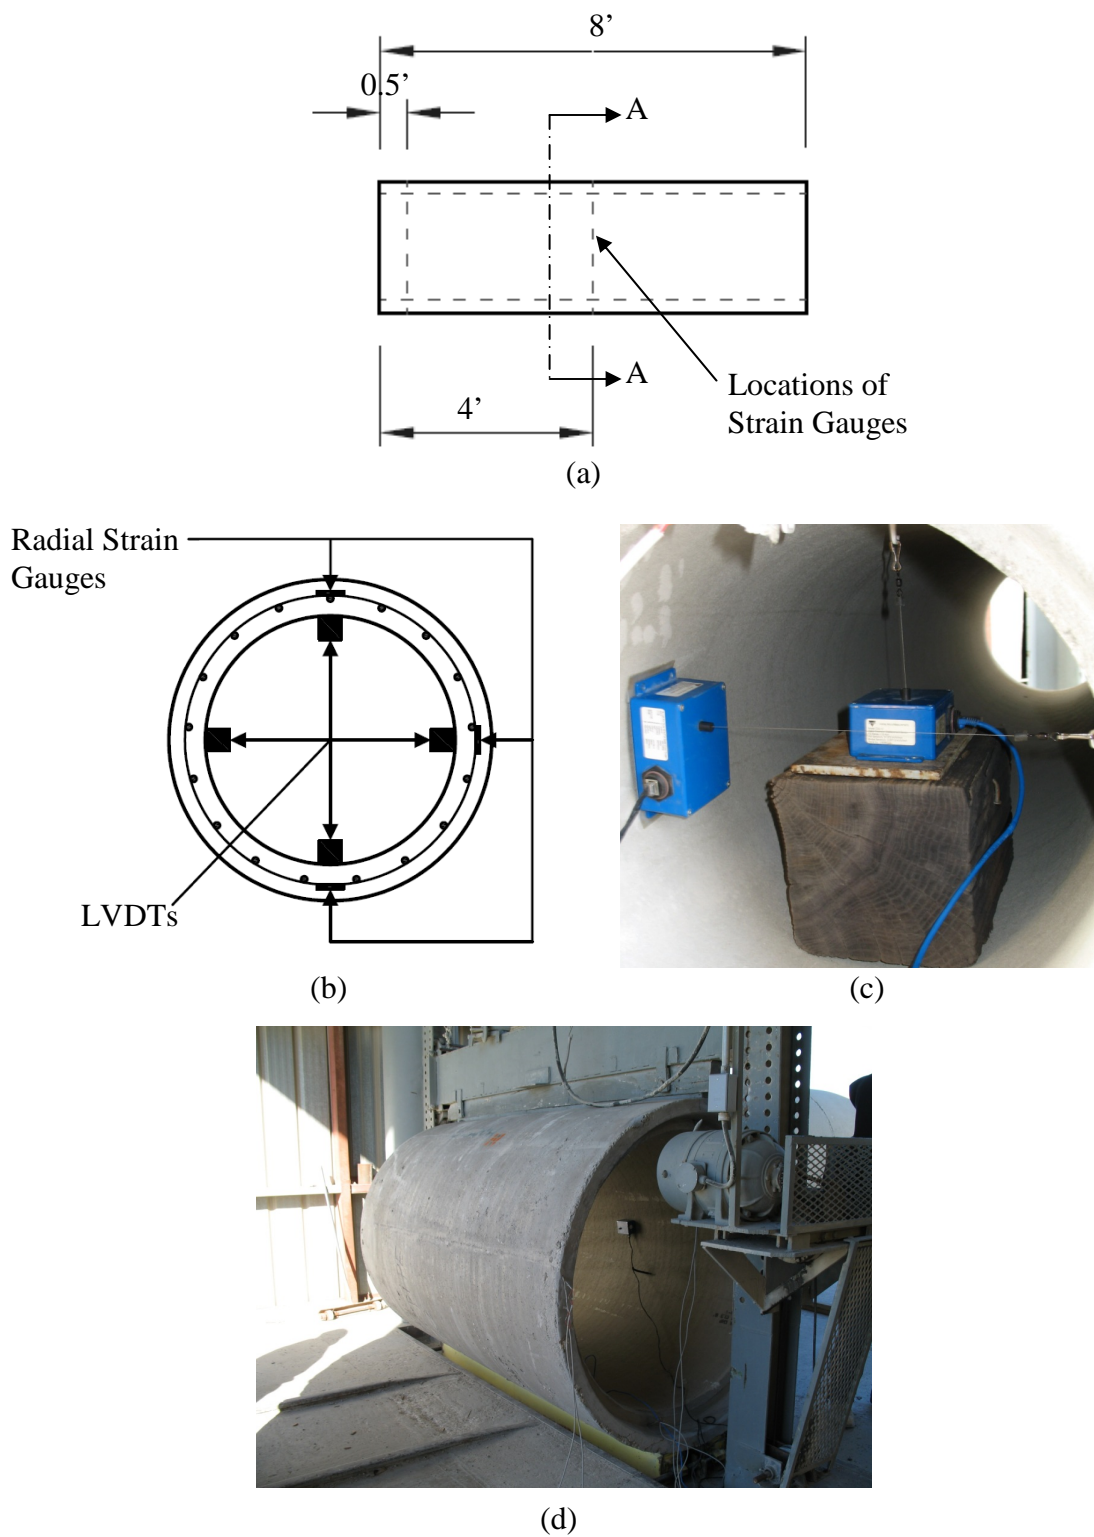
Typical test setup details for D-Load tests; (a) plan view, (b) section A – A, (c) installed LVDTs, (d) pipe set up in TEB machine.
